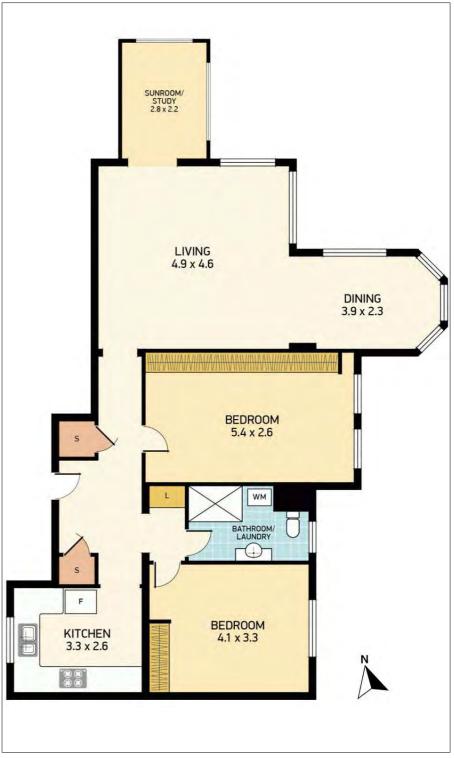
Floorplan of east facing dwelling (source: realestate.comau).
